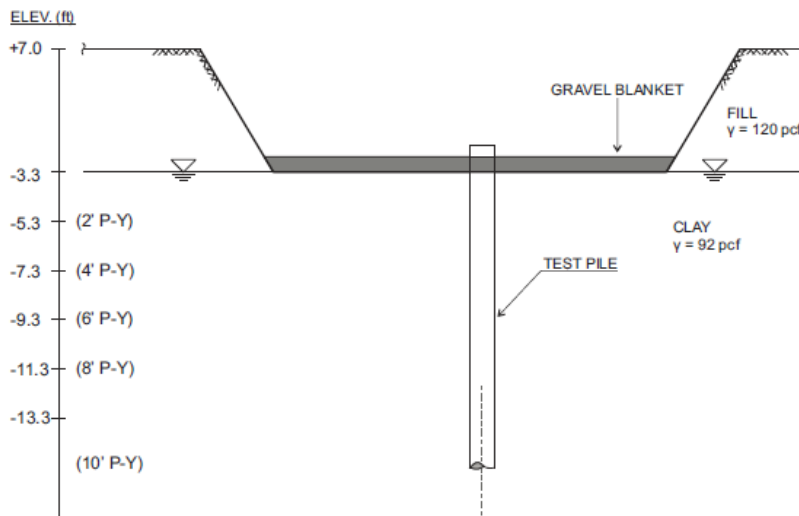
Schematic Cross Section of piles test pit at Site 2, Oakland
